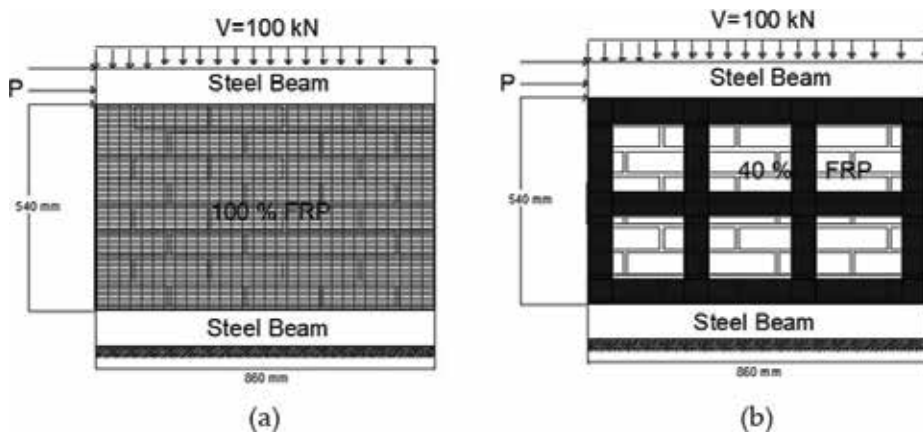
Geometrical details of experiments (a) WALL 3 and (b) WALL 4 [27].
